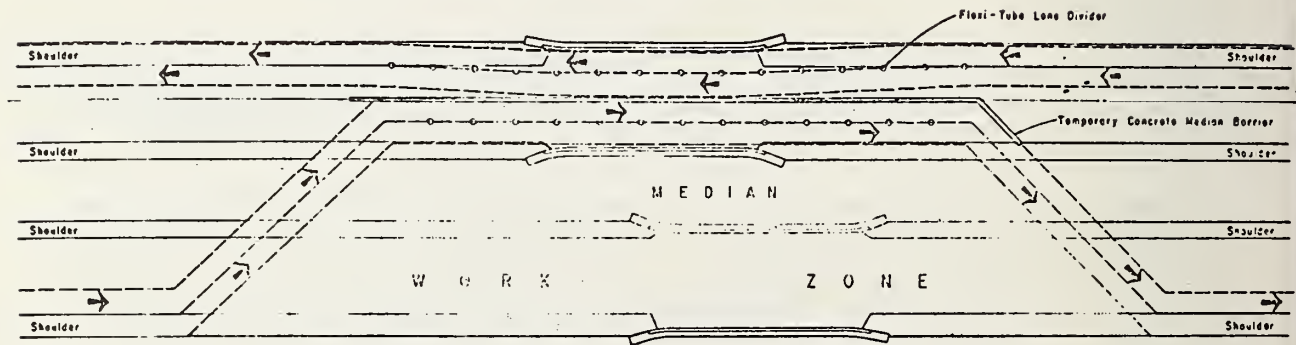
Illinois tollway lane-reversal plan using precast concrete.
